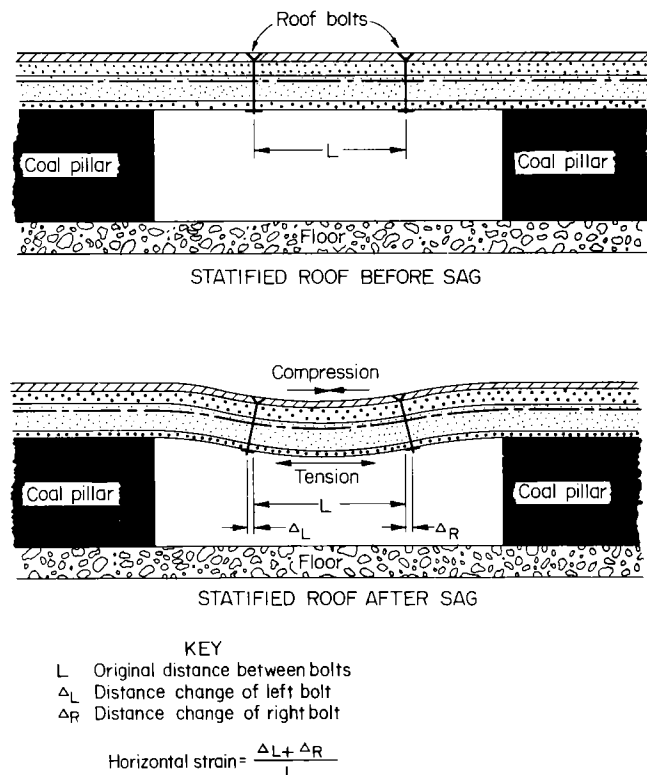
Cross section of a typical coal mine opening illustrating the HORSI principle (4-6).
